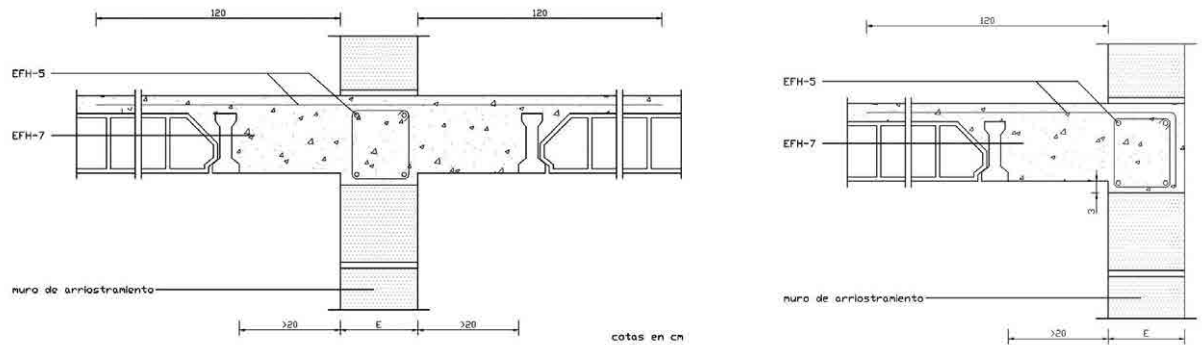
Tie beam on wall. In NTE (Normas Tecnológicas de la Edificación).
